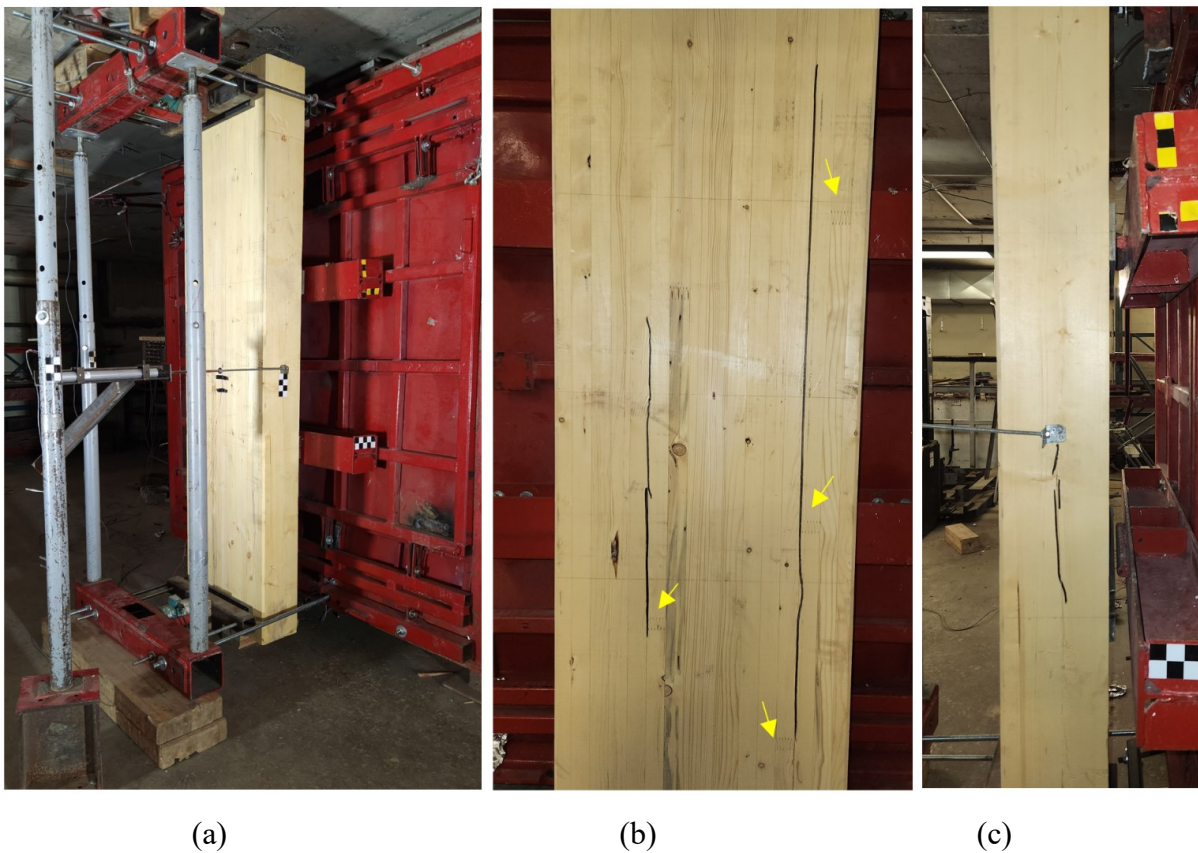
Dynamic Failure of GLT15 [215]: (a) Before test; (b) After test - front view with FJ locations; (c) After test - side view
